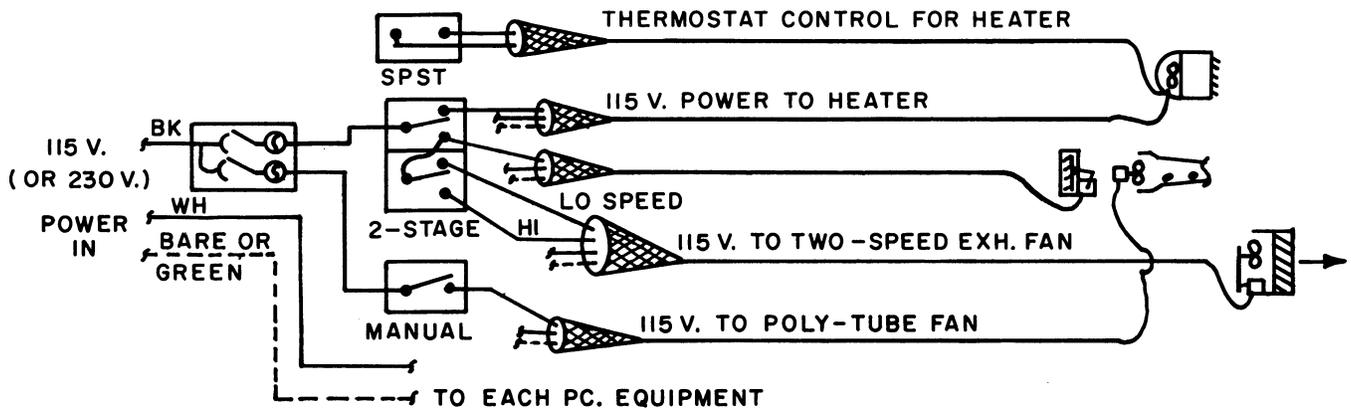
Wiring for a poly-tube heating-ventilation system with one heater, one motorized inlet shutter and a two-speed exhaust fan.
